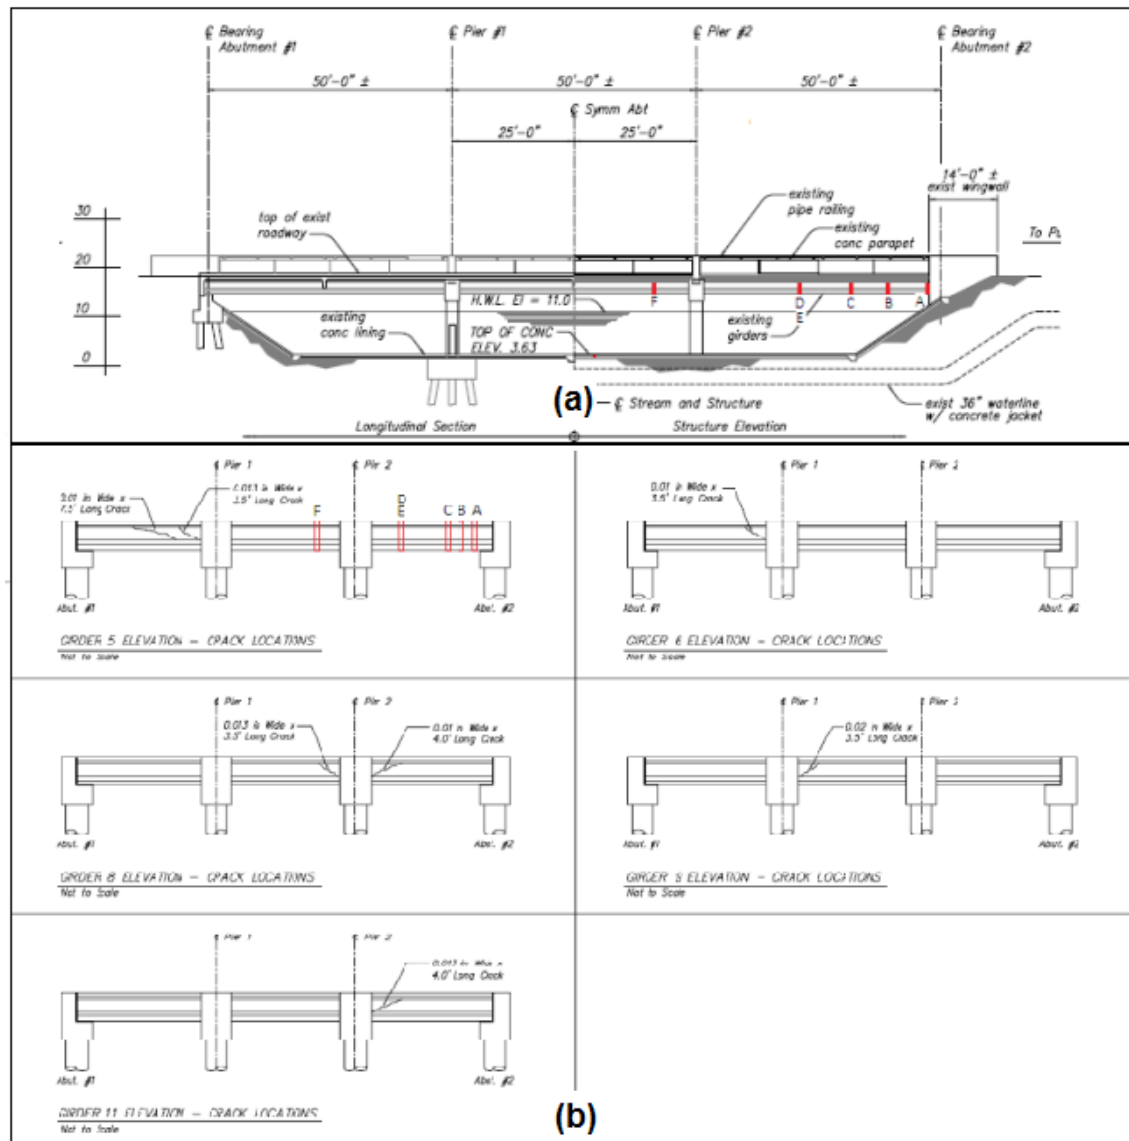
The location of the instrumented CFRP stirrups on the (a) half longitudinal section and elevation drawing, as well as in the (b) girder crack location drawings. Note that the cracks shown in (b) were prior to construction and additional cracks were observed.
